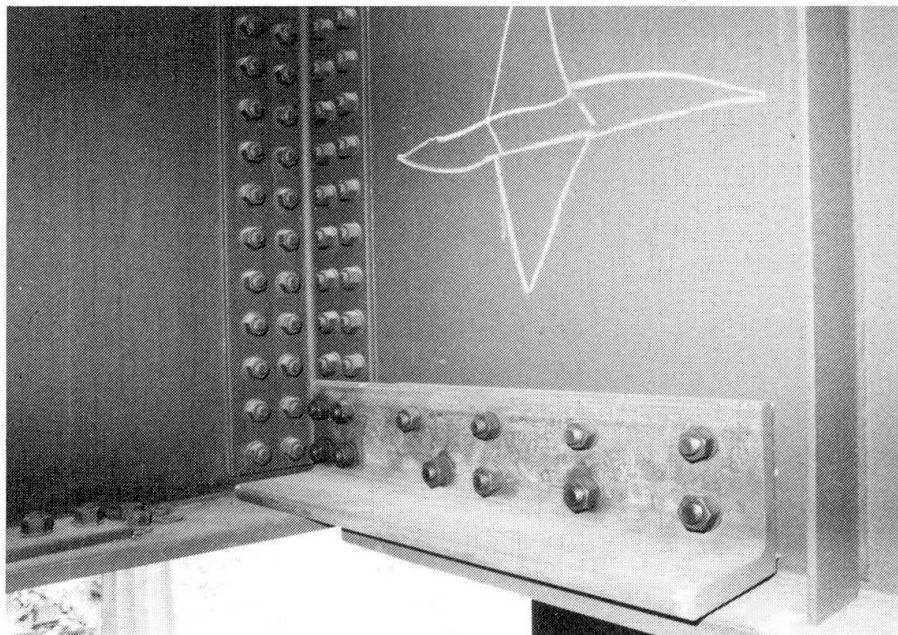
Retrofit of a Longitudinal Girder Bottom Web Gap
